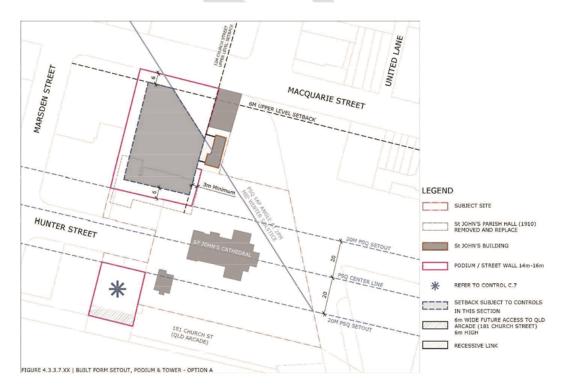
x 6.10.19.7 Built Form setout plan for Option A
